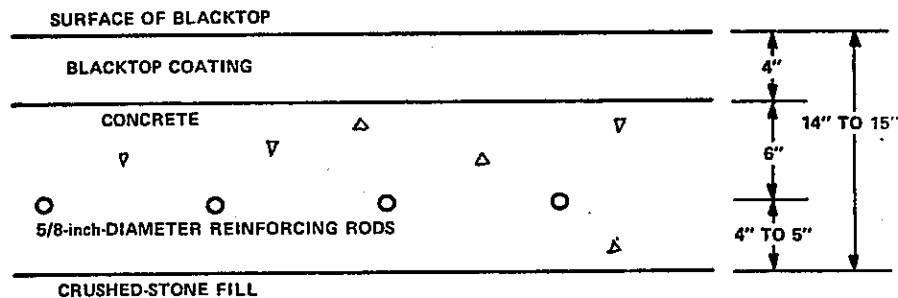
Cross section of bridge approach, north side, northbound bridge, Wehrle Drive and New York State Thruway, near exit 50.
